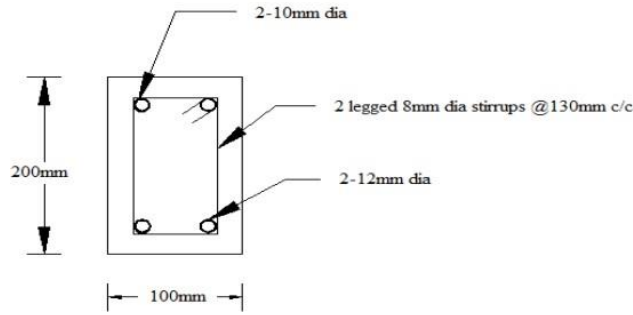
FIG II. REINFORCEMENT DETAILS FOR BEAM CROSS SECTION
